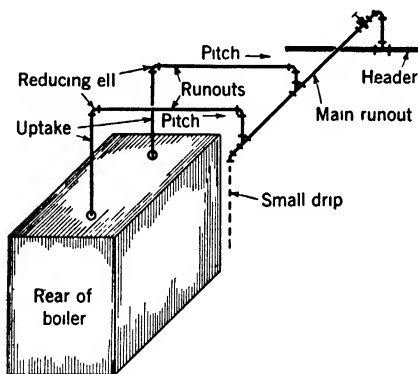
OLD STYLE STANDARD BOILER CONNECTIONS
